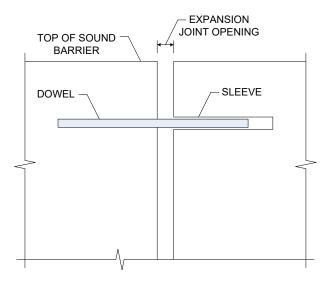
Sliding Dowel-and-Sleeve Connection
